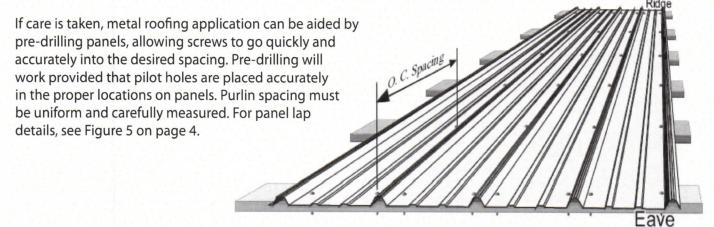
Screws should be placed on both sides of the ribs at both eave and ridge.
